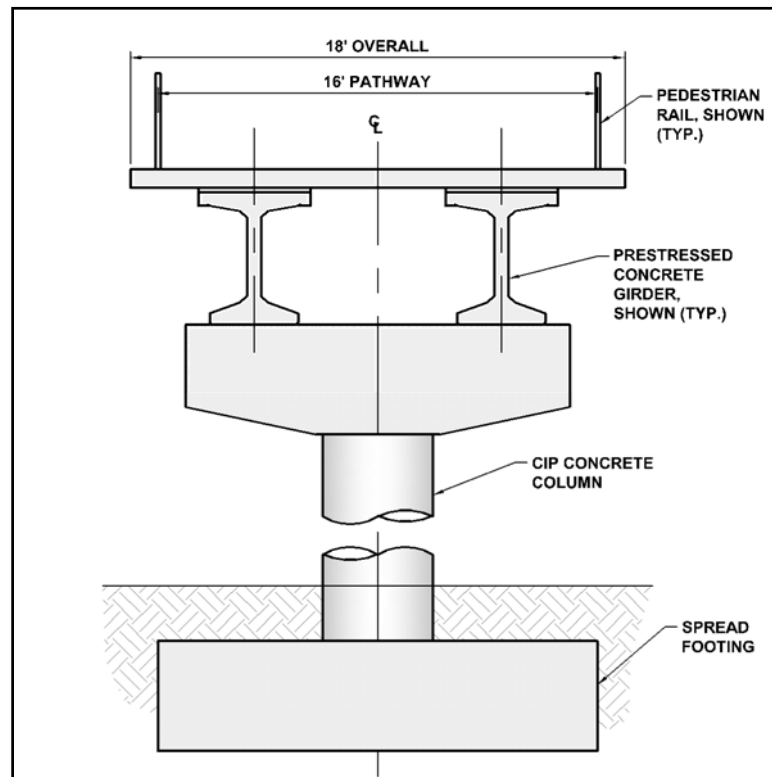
Northern White River Bridge Trail Approach – Girder Section
